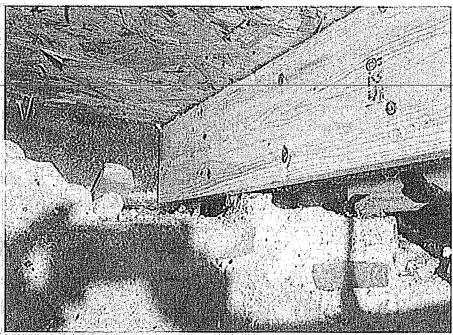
New floor joists not bearing on foundation wall, supported by rim joist.
